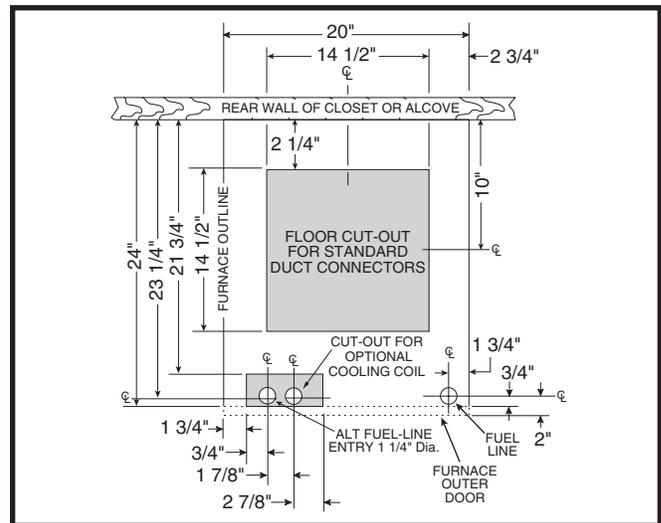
Cut-Out Dimensions for Standard Duct Connectors
